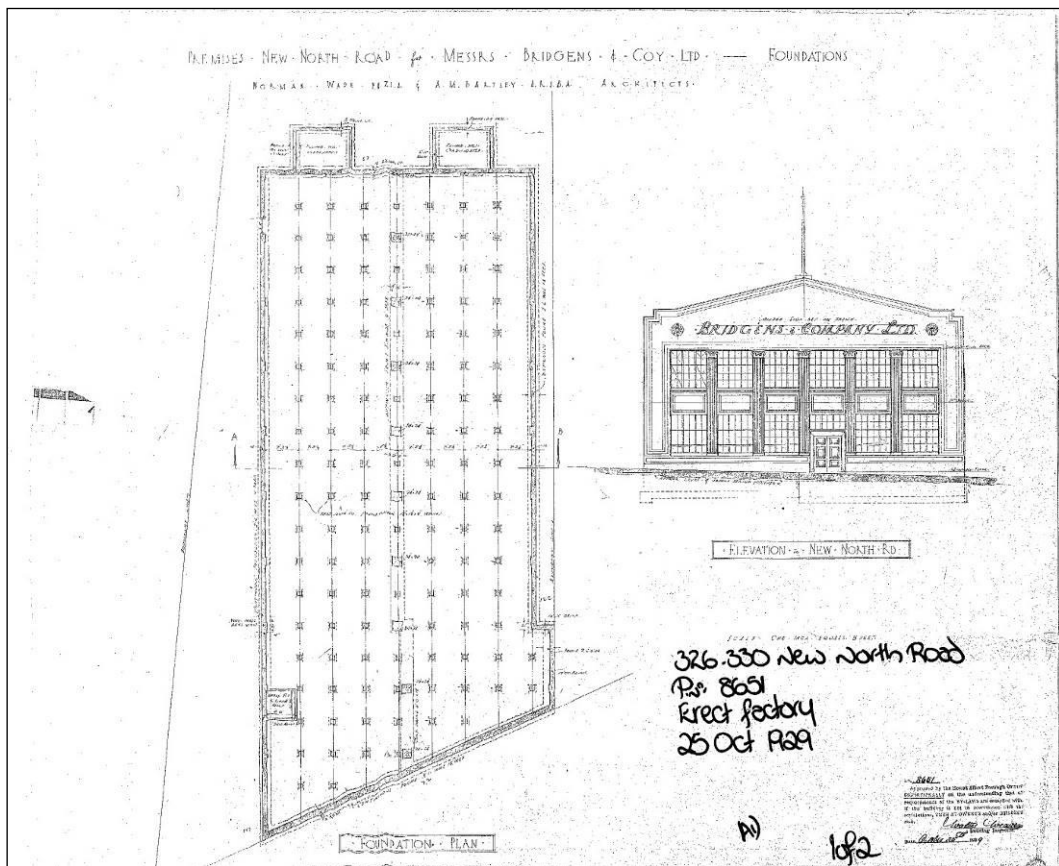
1929 Drawings for 'Premises New North Road for Messrs Bridgens and Coy Ltd' - by Wade and Bartley Architects: Foundation Plan and Front (or street) Elevation. Auckland Council Filenet. Accessed October 2016.
